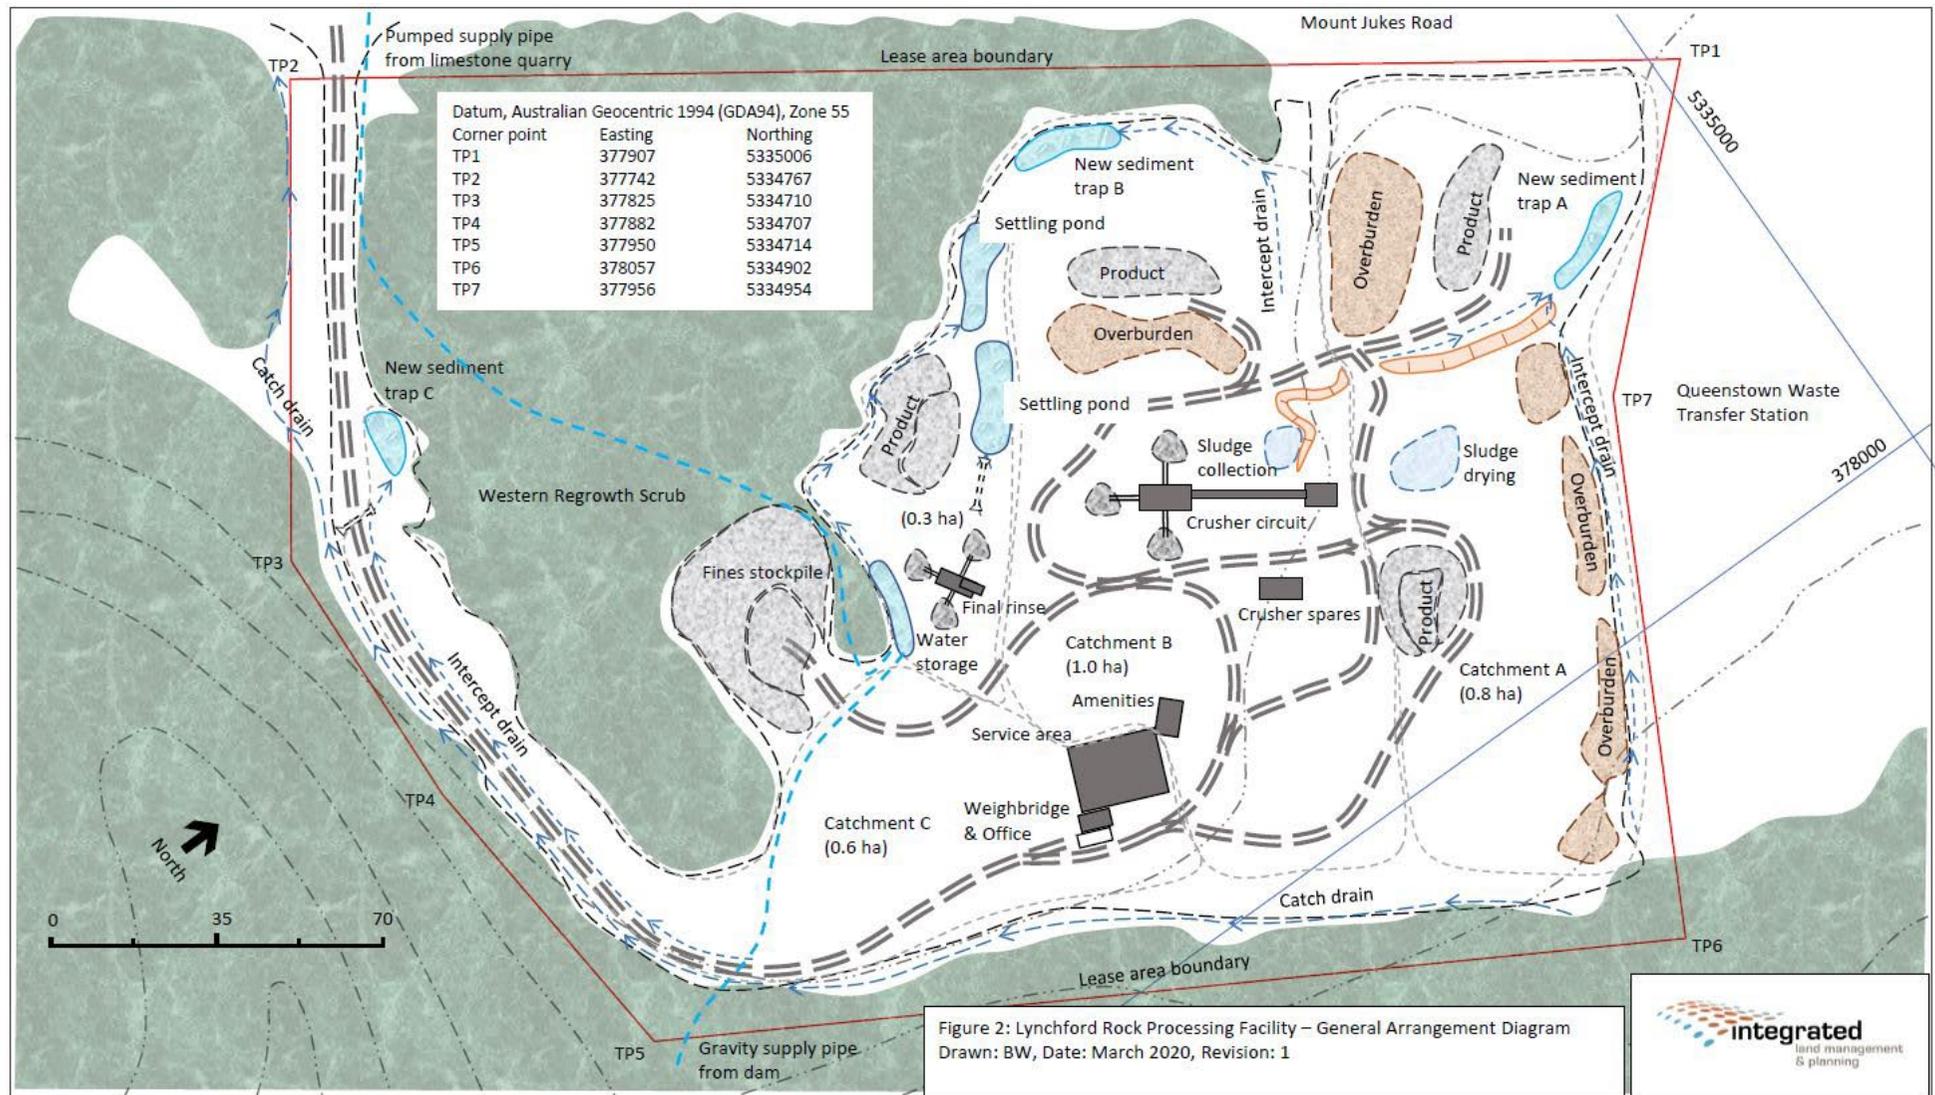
Site layout plan of Lynchford rock processing facility (Figure 2 of EER).
